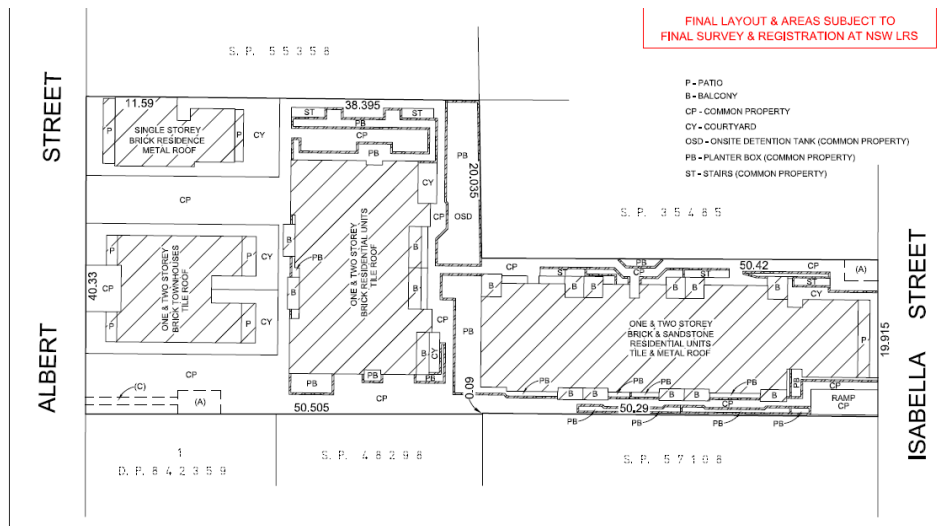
Location plan for plan of Strata Subdivision (extracted from submitted plans).
